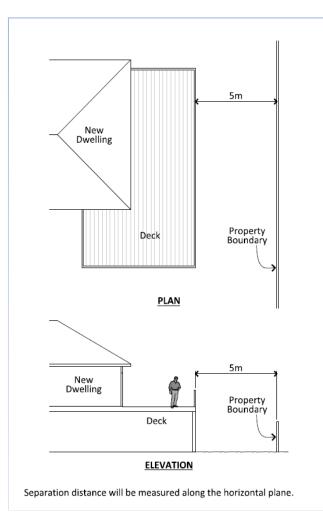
Upper-floor setbacks for separation and privacy
